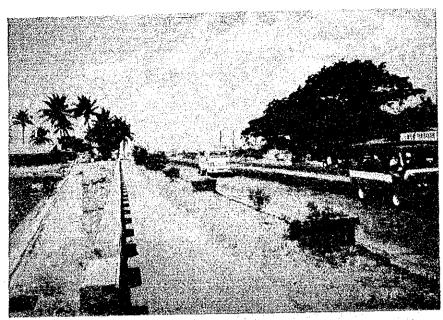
Existing Road Condition Connected to Ro/Ro Terminal (Iloilo) Source: JICA Study Team
